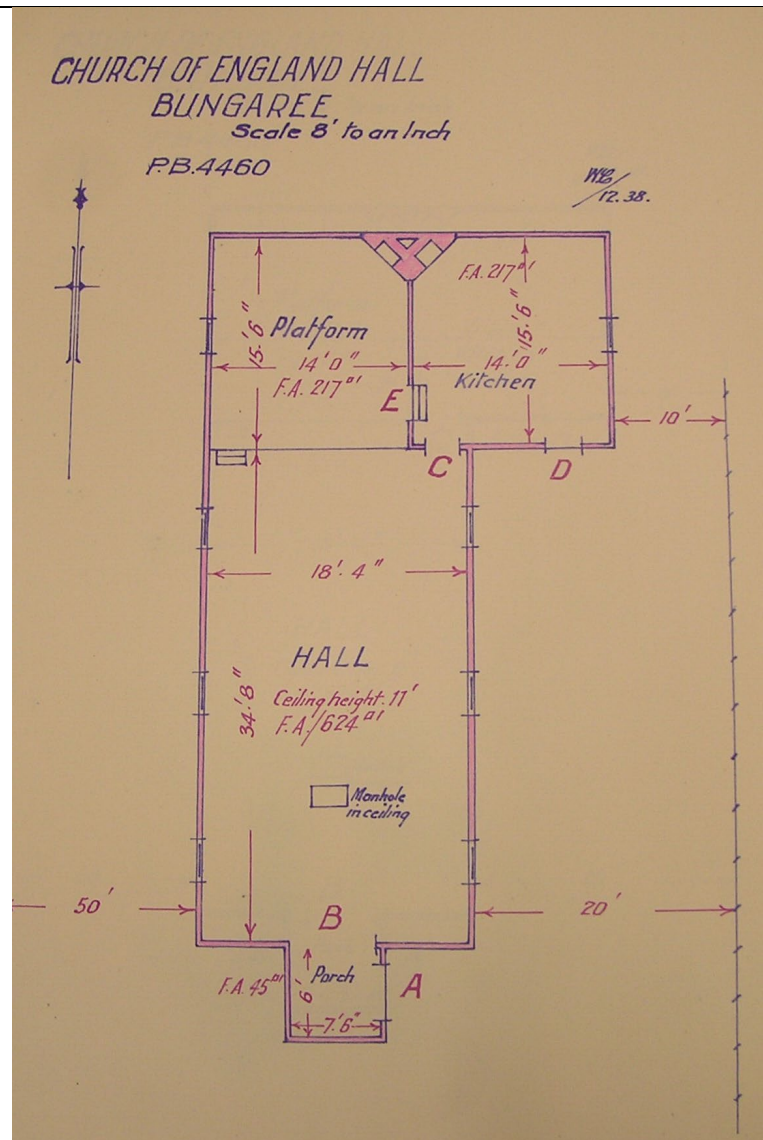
Plan of the Church of England Hall, Bungaree, n.d. [1931].
